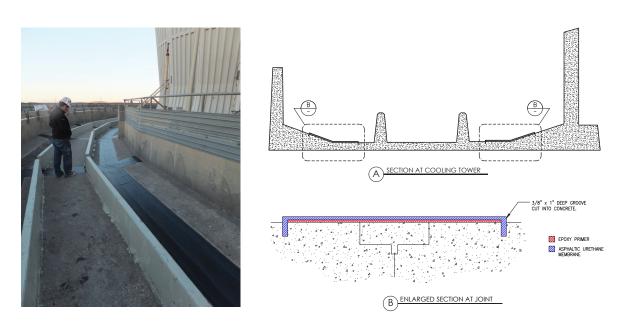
Completed hot water basin floor repairs including concrete repairs and waterproofing.
